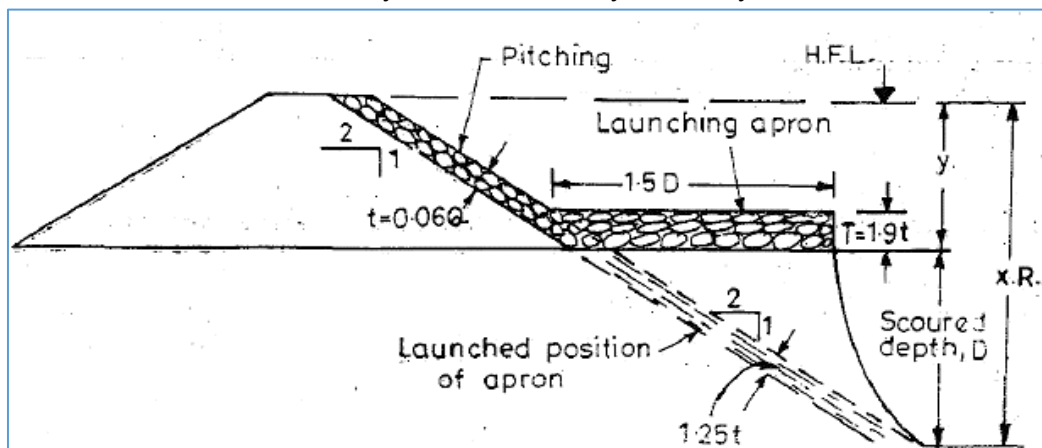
Typical arrangement of launching apron at an angle (S.K. Garg, 2006)
